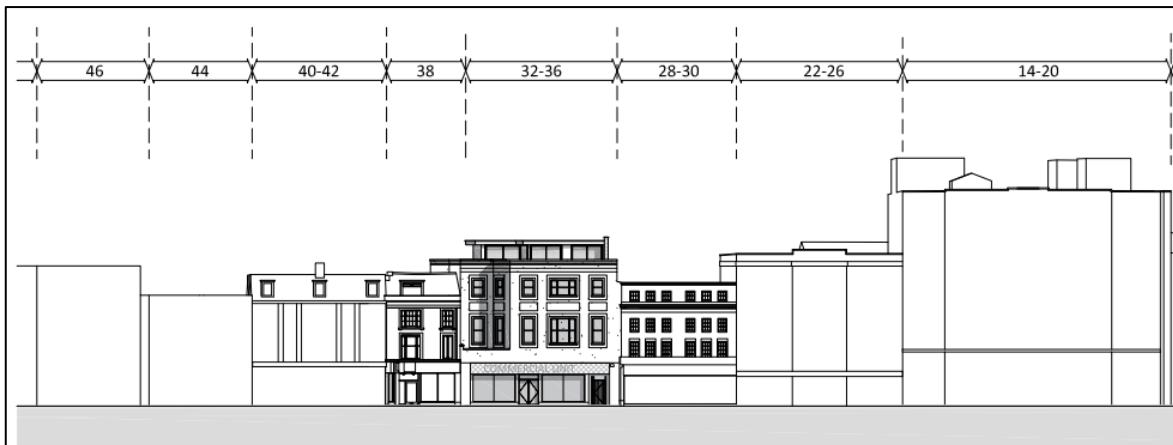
AWDM/0821/20 Approved Elevation from South Street
